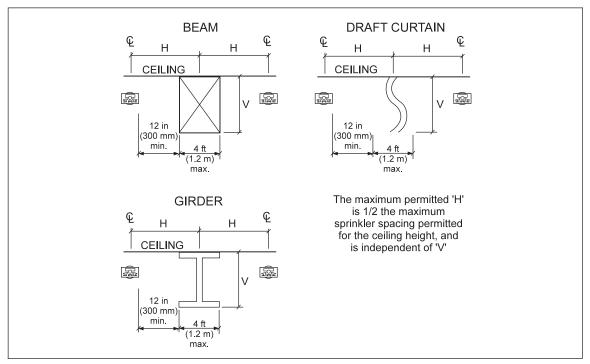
Positioning of sidewall Nonstorage Sprinklers to account for obstructed umbrella discharge pattern along the mounting wall caused by solid objects at ceiling level
